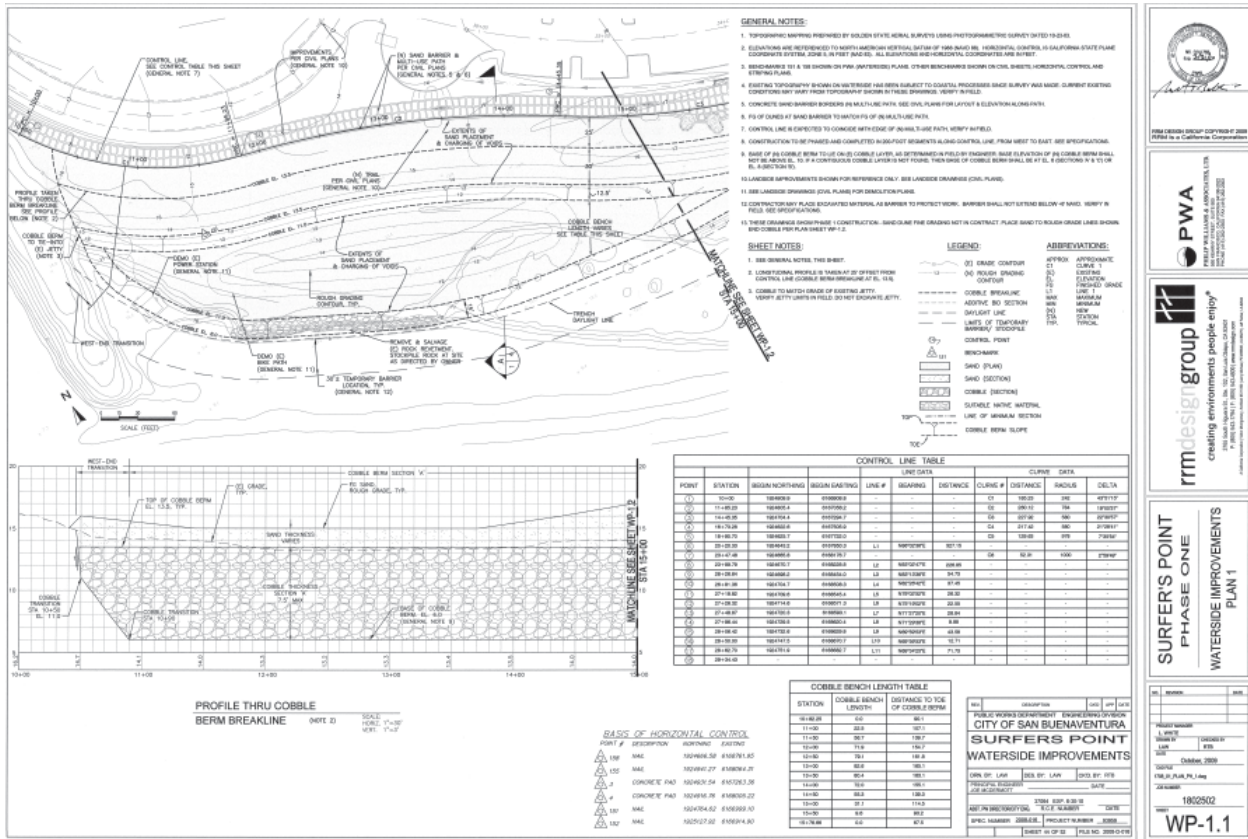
Plan and typical section of water side design. Source: PWA, 2010.
